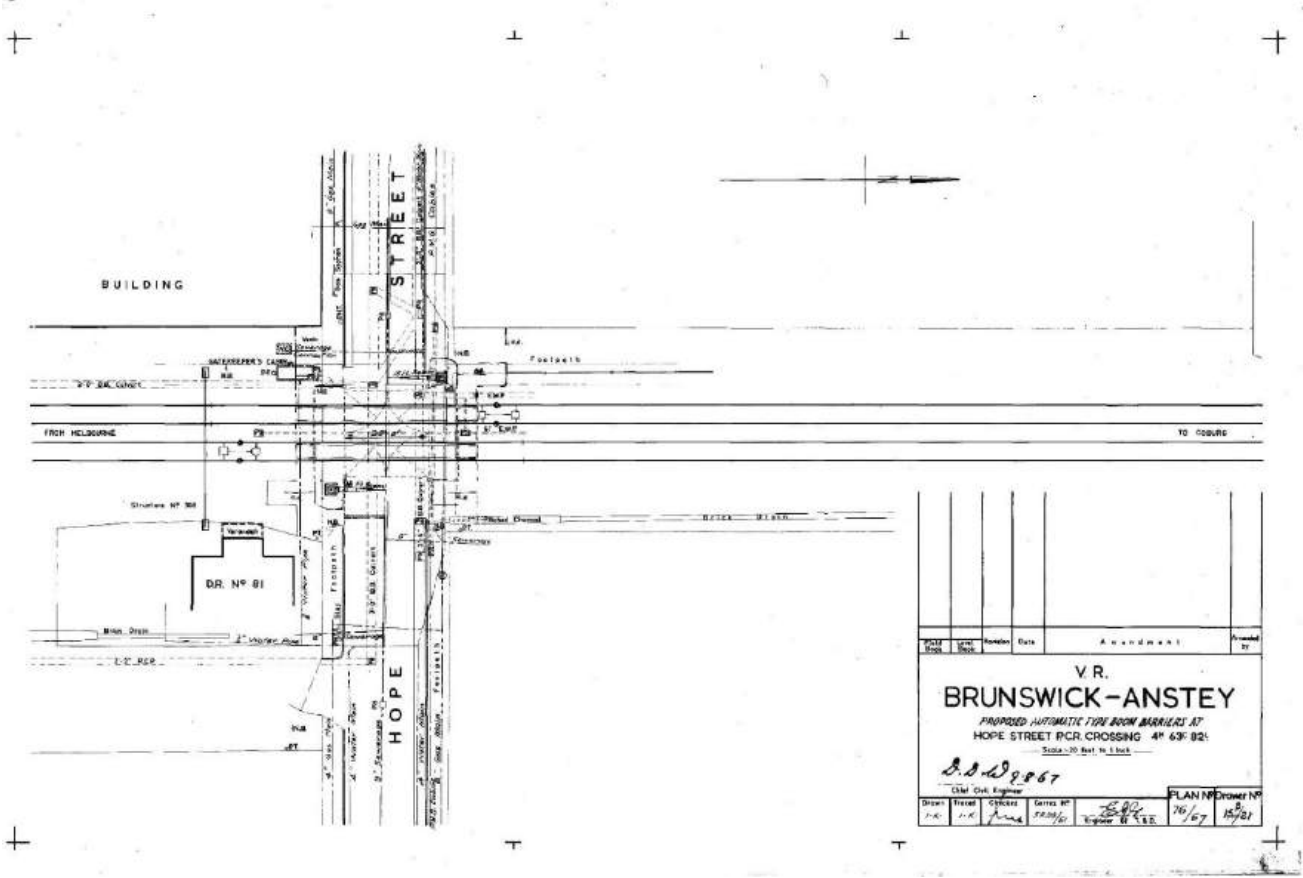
1967 Detail drawing of the Hope Street intersection proposed automatic boom barriers. Plan shows gatekeepers cabin at south-west of intersection. North is to right. (Public transport Victoria Drawing Management System. 10/06/2020).
